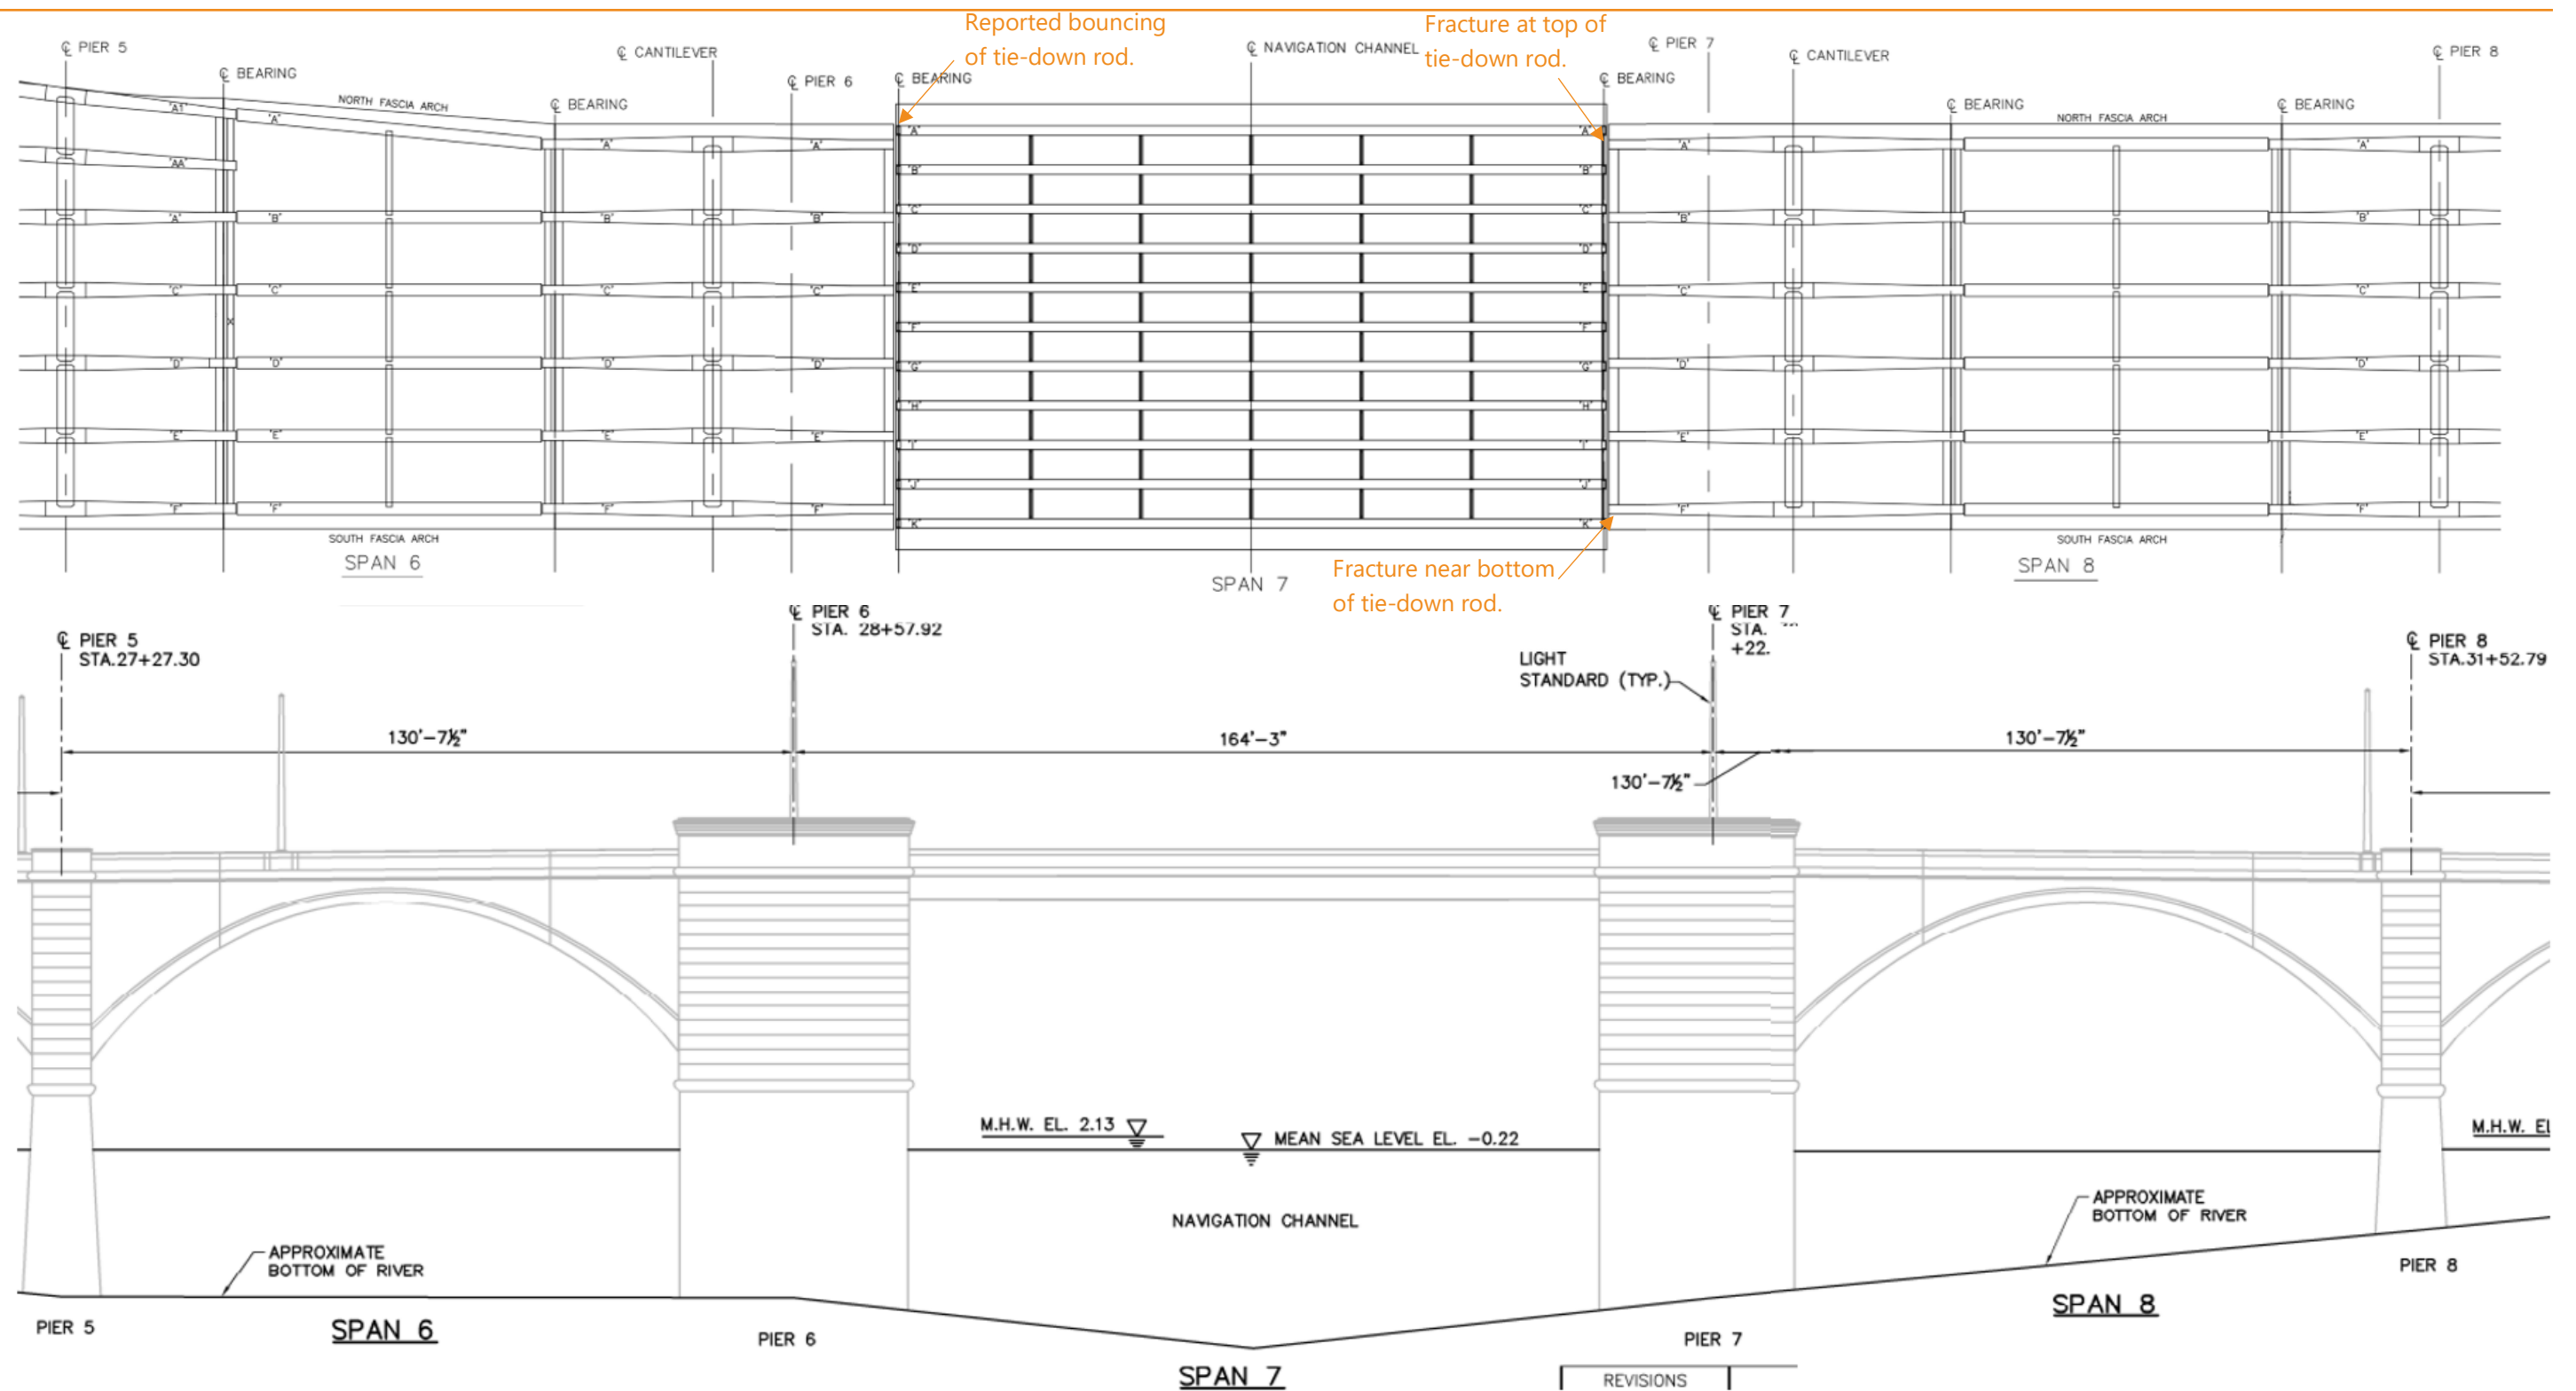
Framing Plan and Elevation of Spans 6 through 8, southbound I-195 Washington Bridge North (700)
